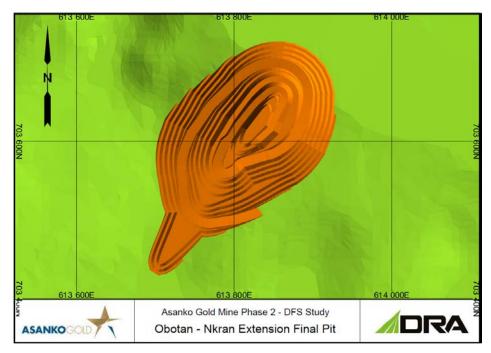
Nkran Extension Pit Design (source: Asanko Gold 2017)
